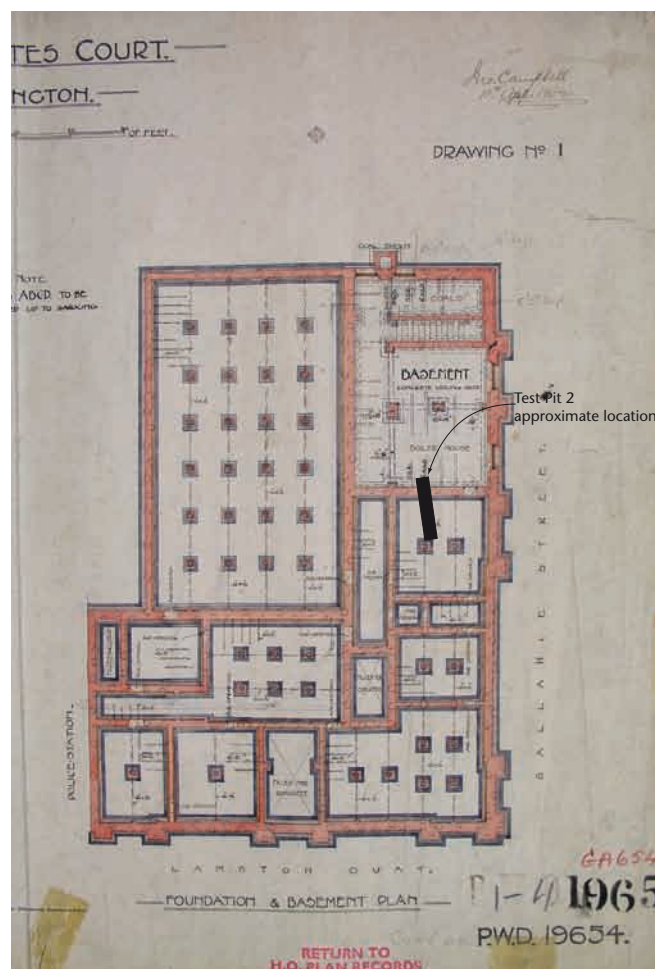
Approximate location of Test Pit 2, overlain on the 1902 Public Works Department foundation plan of the Magistrates Court.
